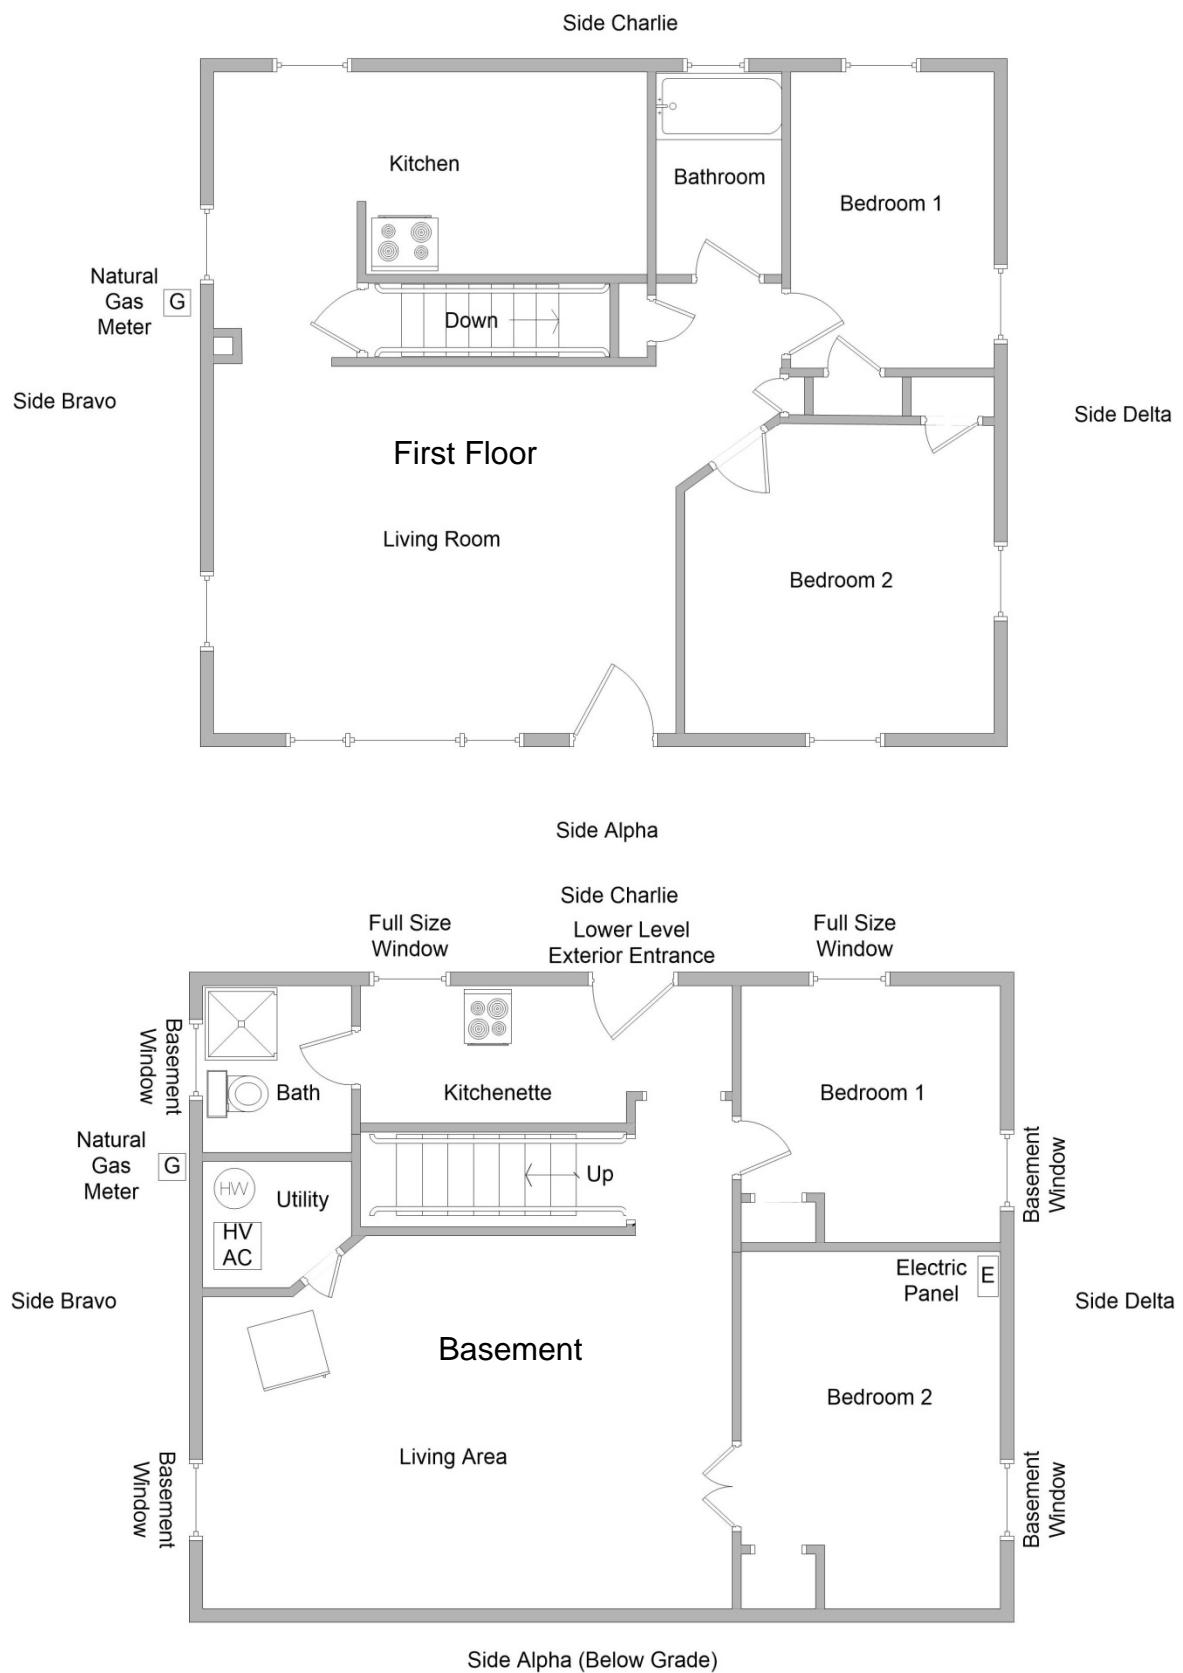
Floor Plans for Structure at 6404 57th Avenue, Riverdale Heights, MD
